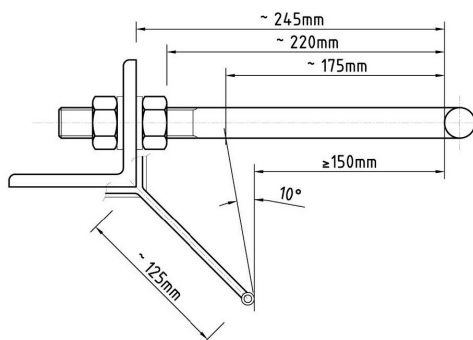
Minimum Dimensions of Step Bolts (Top view) [6,7]
